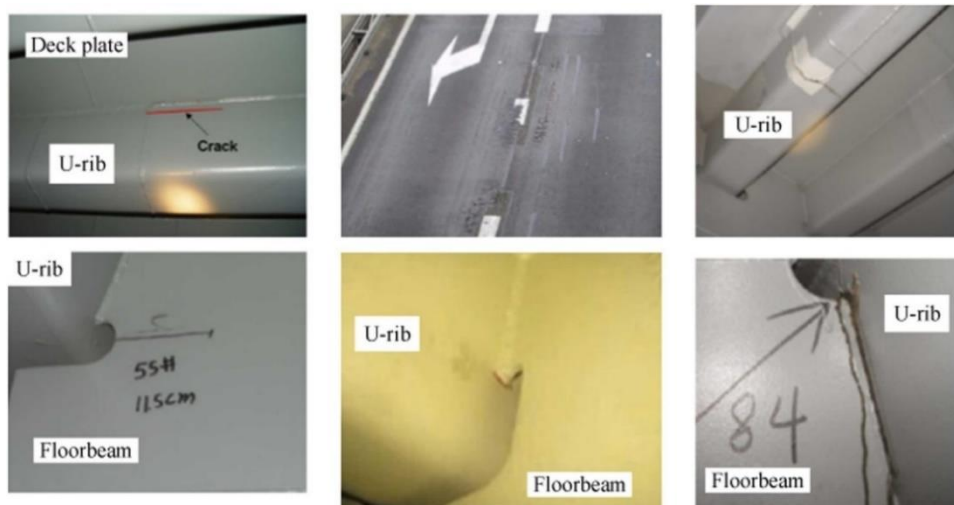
Typical fatigue cracks of U-rib stiffened steel deck (Abdelbaset and Zhu, 2024)
